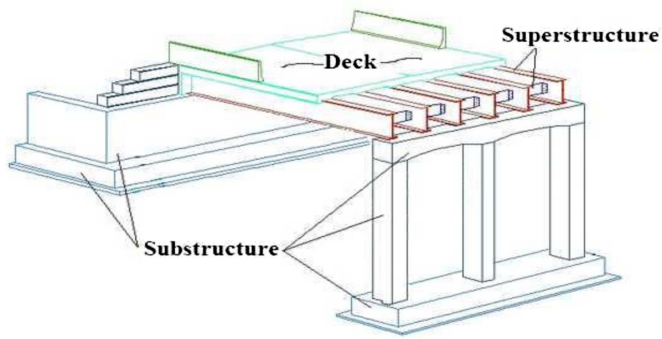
Structural elements of a typical highway bridge. (Adapted from MDOT 2018.)
